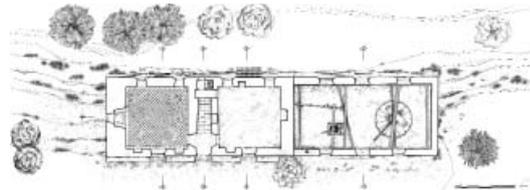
The "Askitario" Monastery Complex. First Floor Plan.
